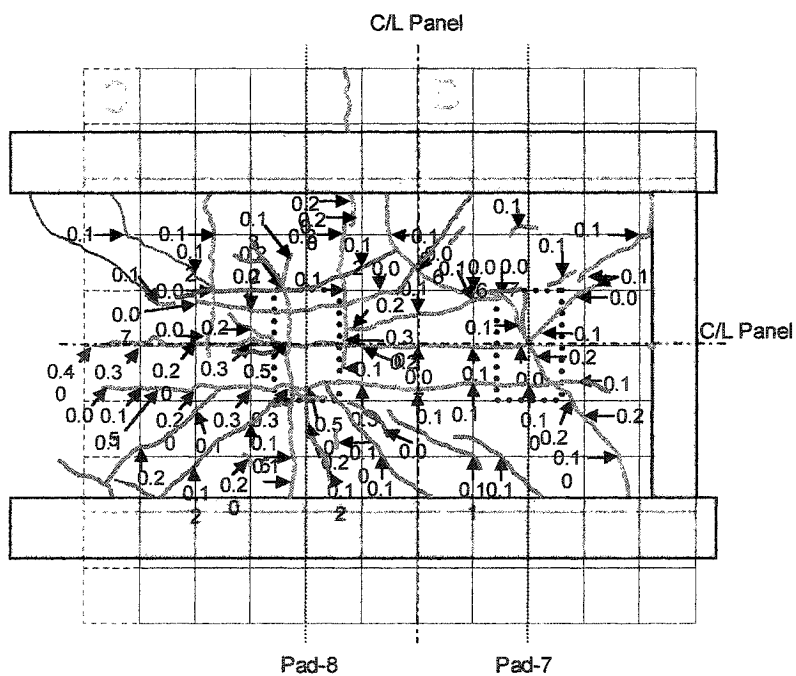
Panel-D: Crack Patterns on Soffit after 5,000 Load Cycles at 883 kN
